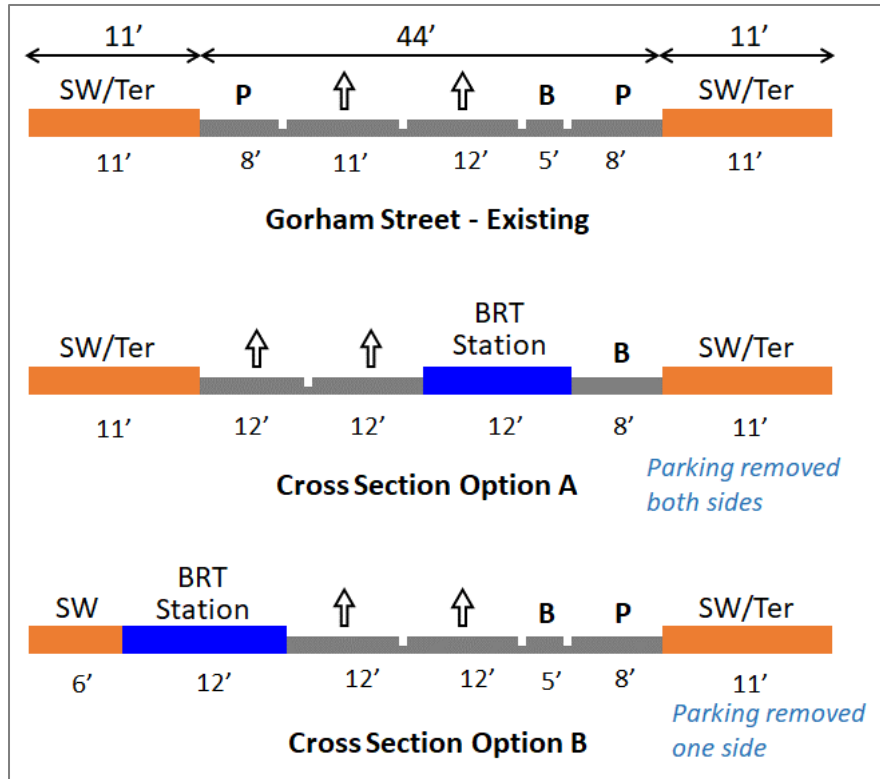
Existing and conceptual cross sections for Gorham Street just west of State Street
